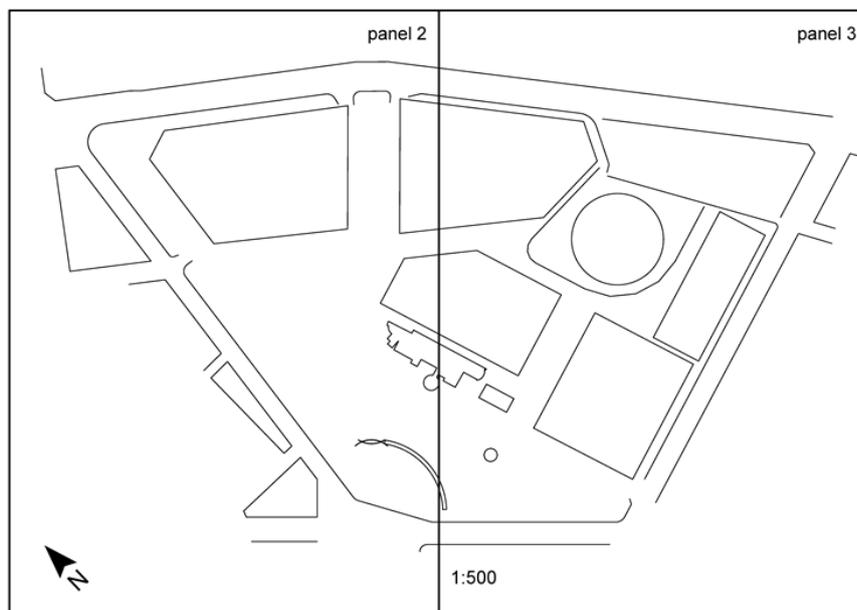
Recommended scale and orientation of the ground floor plan in panels number 2 and 3
